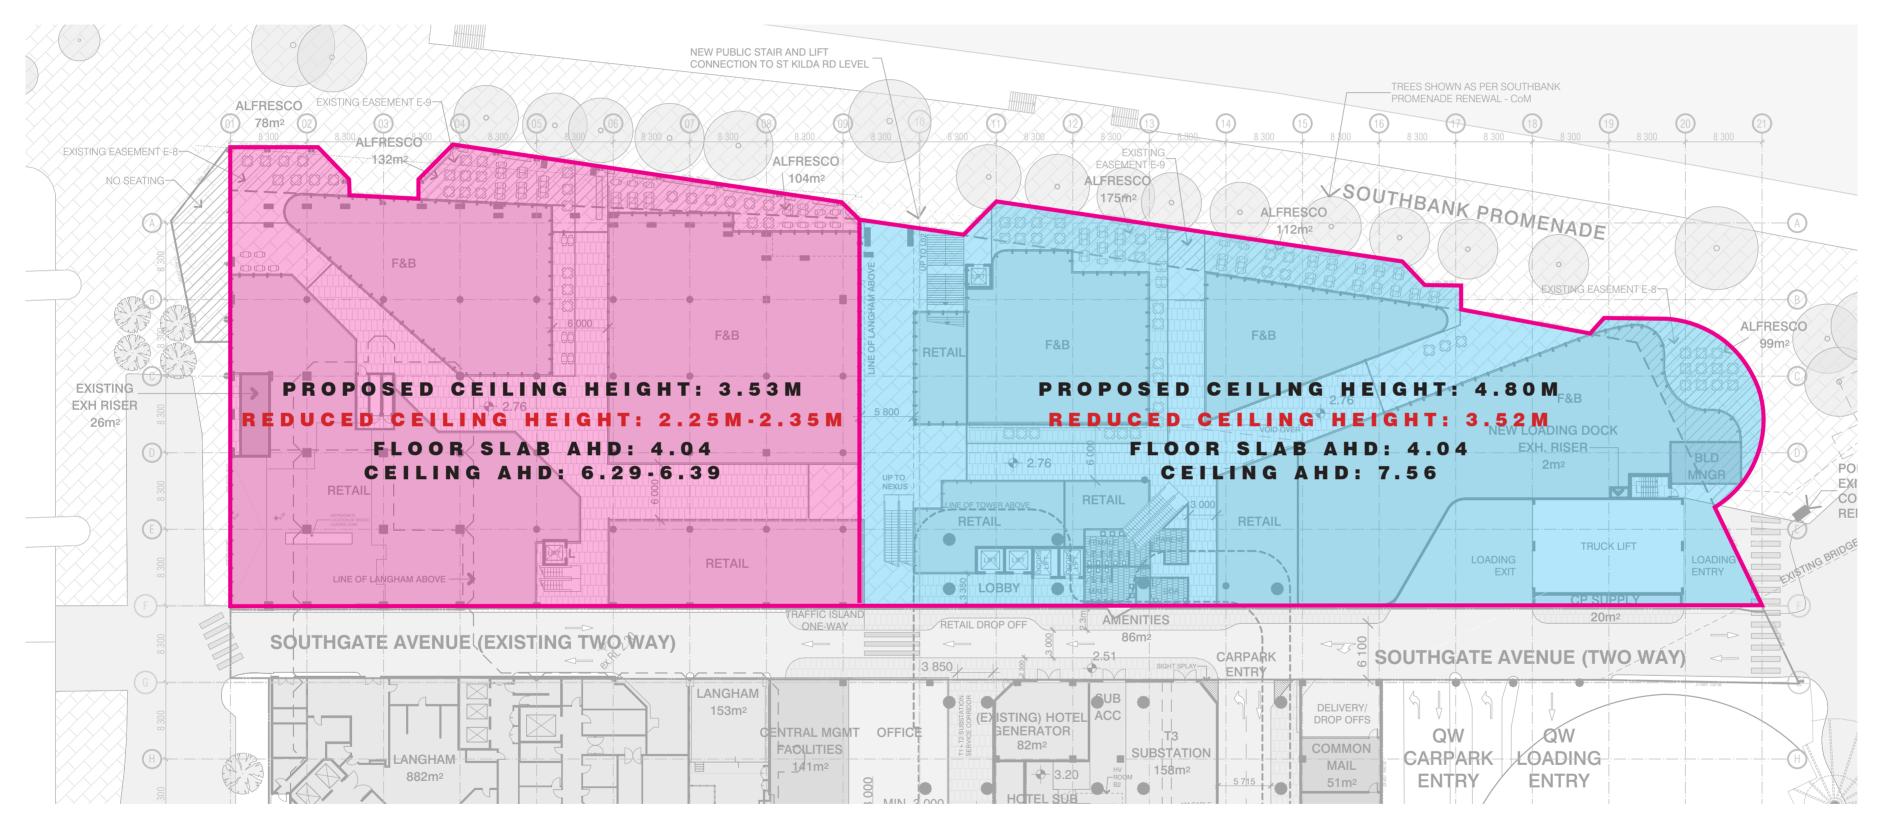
DIAGRAM OVERLAY OF CEILING HEIGHT IMPACT TO RAISED GROUND SLAB LEVEL
